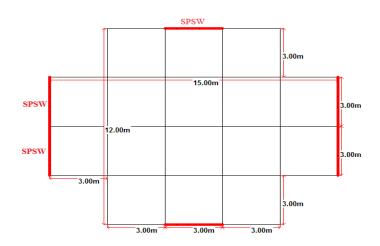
Plan of a steel frame buildings with SPSW(Strip and Mesh frame model)
